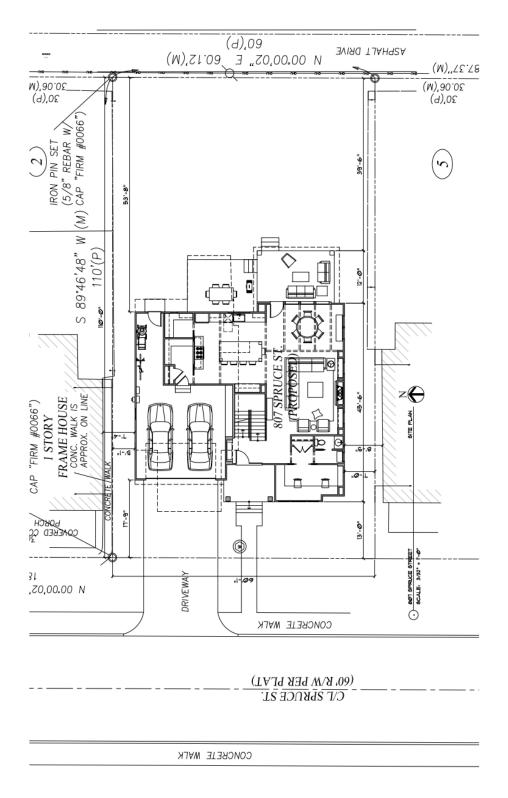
Site plan of the proposed single-family dwelling for this variance petition.
